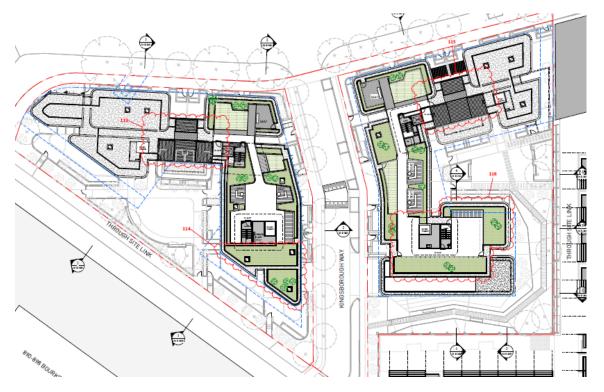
Proposed rooftop terrace plan showing the removal of communal open space areas as per condition 4 of D/2020/93 and replaced with landscaping/green roof
